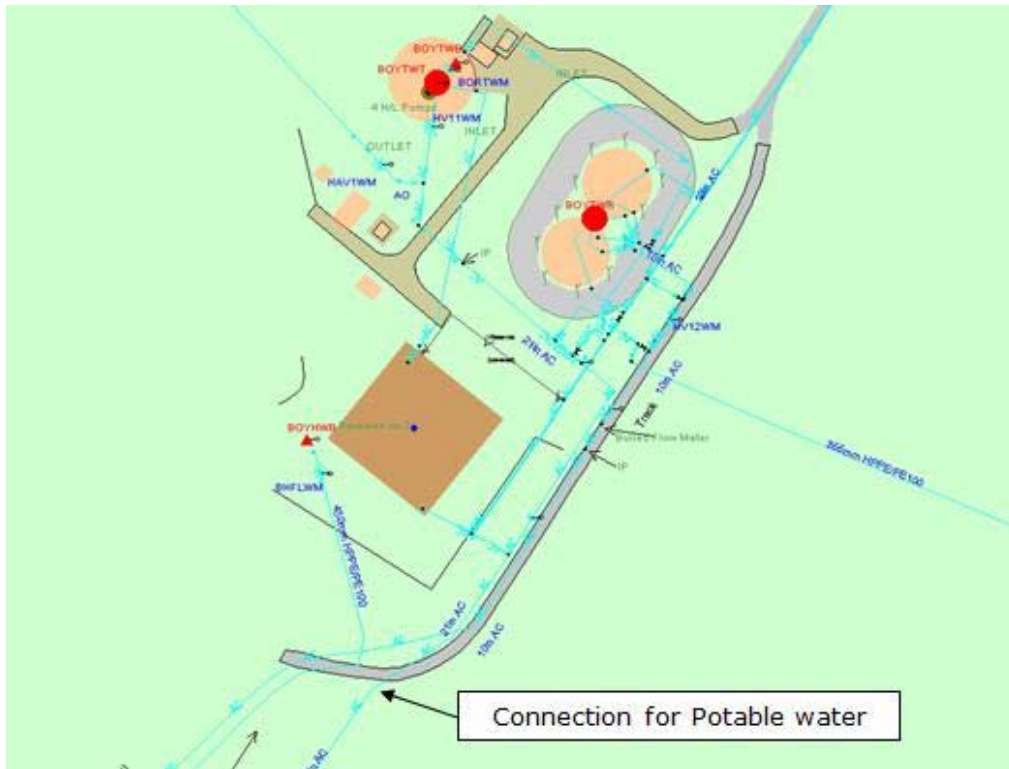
Showing your water point of connection at Boyton Hall Water Tower, accessed from Witherfield Road, Great Wratting at NGR TL6744847217.
